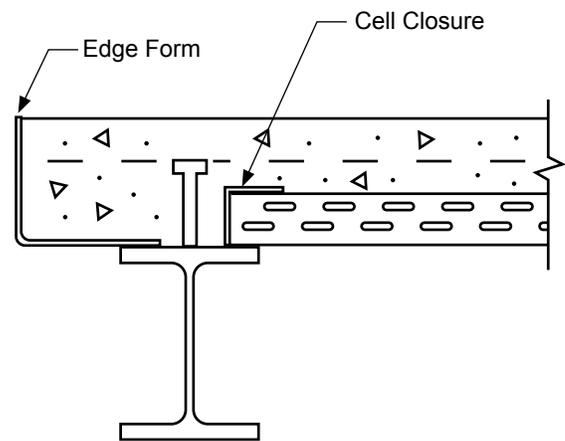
SINGLE PIECE EDGE FORM PERPENDICULAR TO DECK ON WIDE FLANGE BEAM
